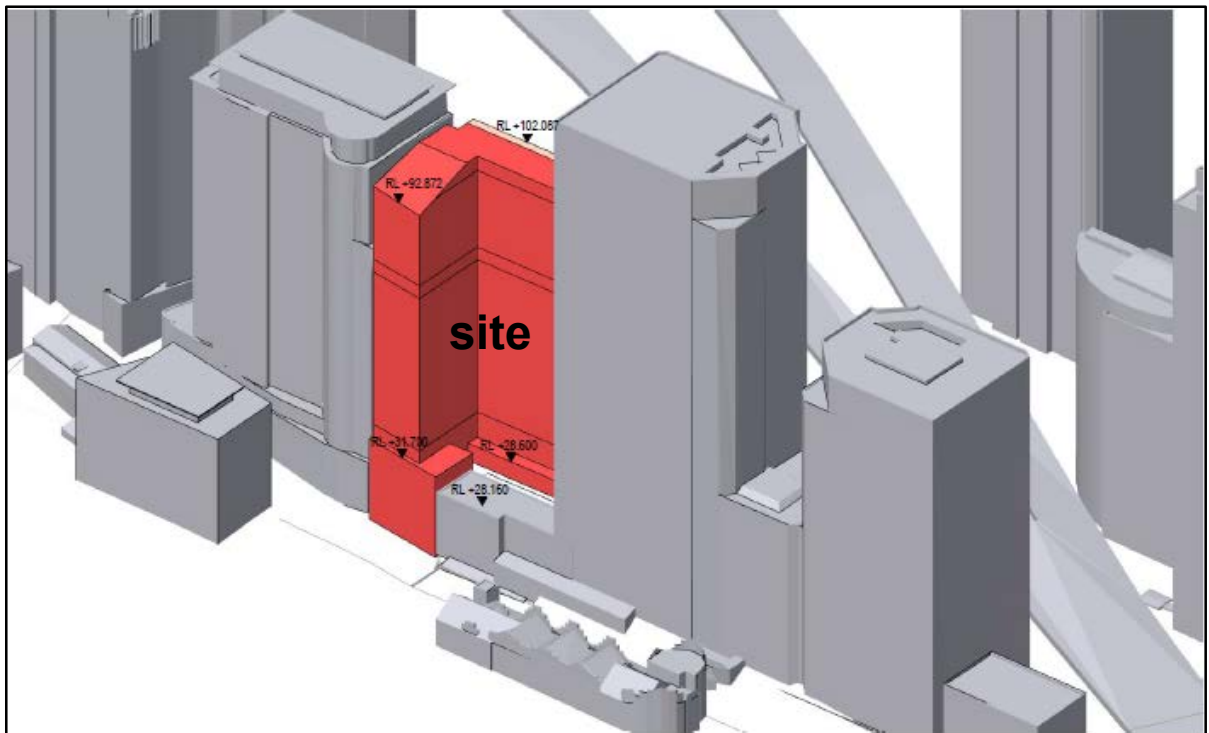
Proposed building envelope as viewed southeast from Jenkins Street
